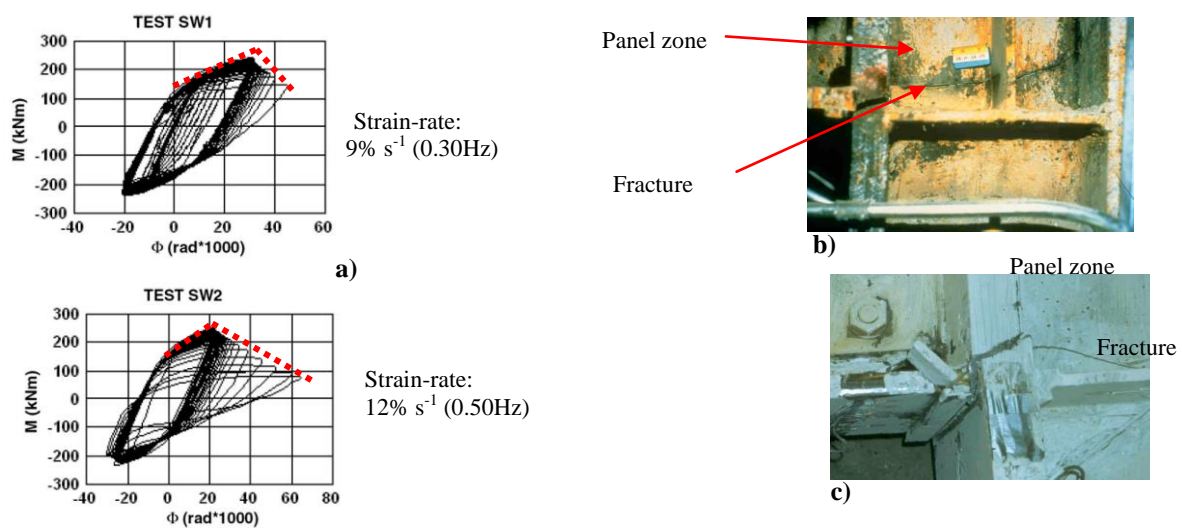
a) Behaviour of fully welded beam column specimen under strain-rate, [9] b) Northridge observed damage, c) experimentally produced damage [3]
